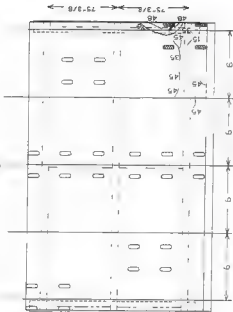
Top Cracking Pattern (Fourth Bridge - Test No 5)
